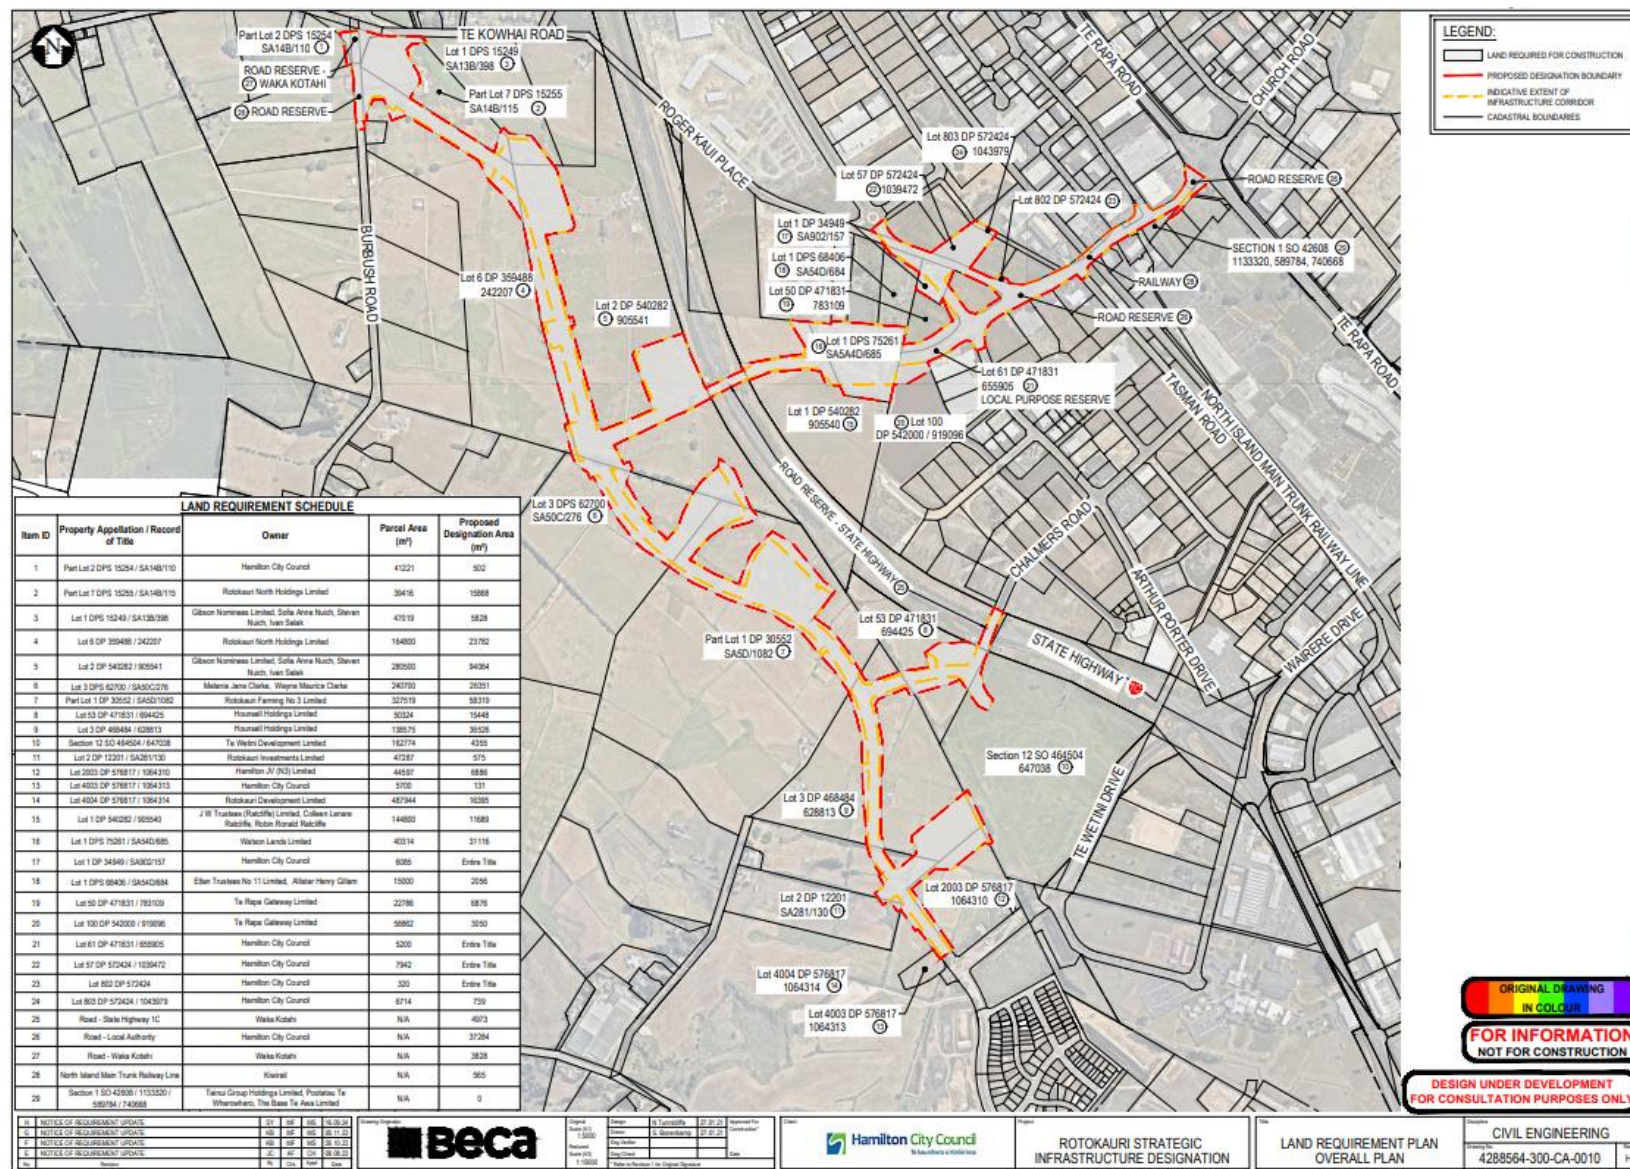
Extent of Designation Land Requirement Plans - General Arrangement Overview (refer Appendix A (Revision H) for details).
